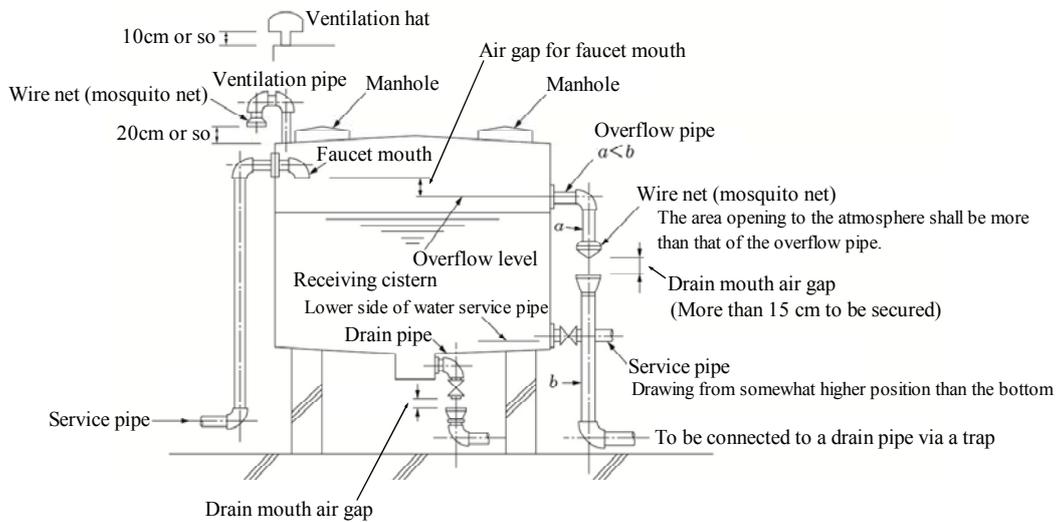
Example of air gap for drainage pipe of a receiving cistern etc.
